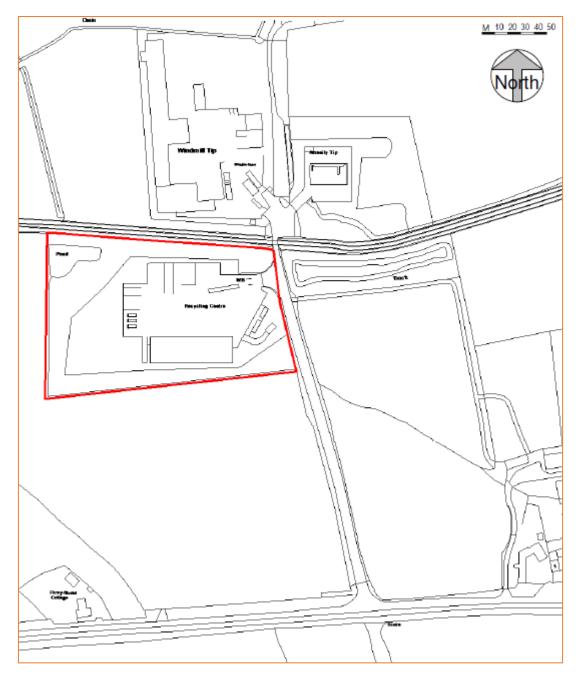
Site Location Plan (Source: TACP Architecture Ltd)
